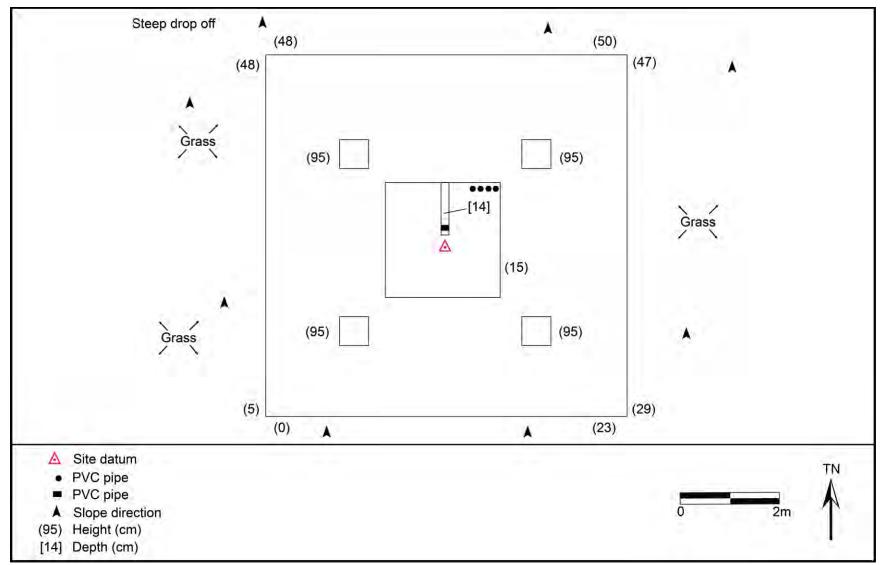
Plan map of SIHP 50-30-06-XXXXX (TS-001), Feature 2, concrete building foundation.
